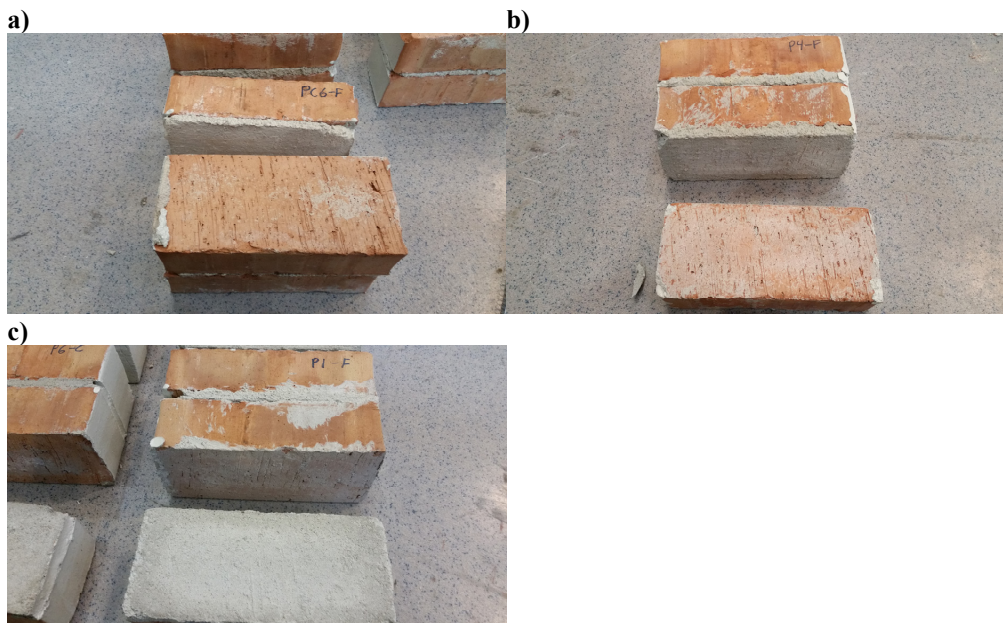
Degree of mortar mud deposit on fracture surface of bricks after shear testing. Examples a) marginal (1), b) moderate (5), c) heavy (8)
